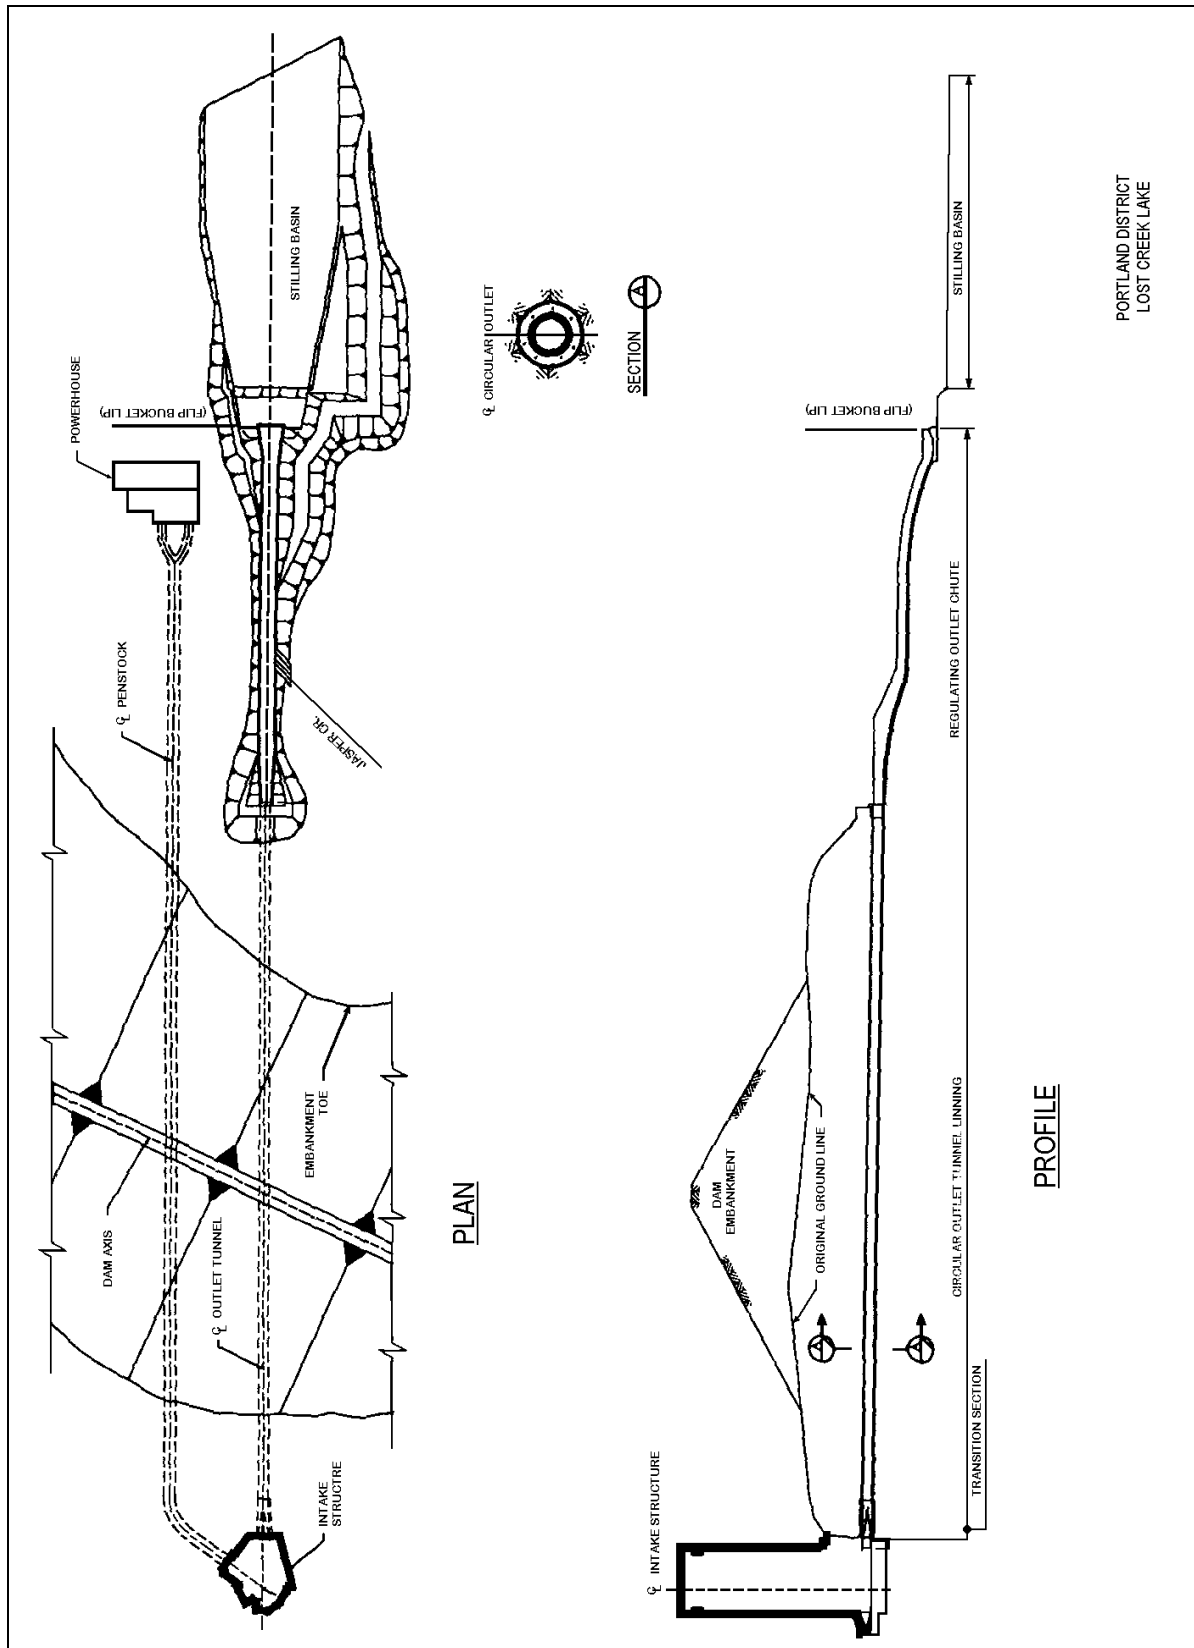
Outlet works through abutment, Lost Creek Lake, Oregon
